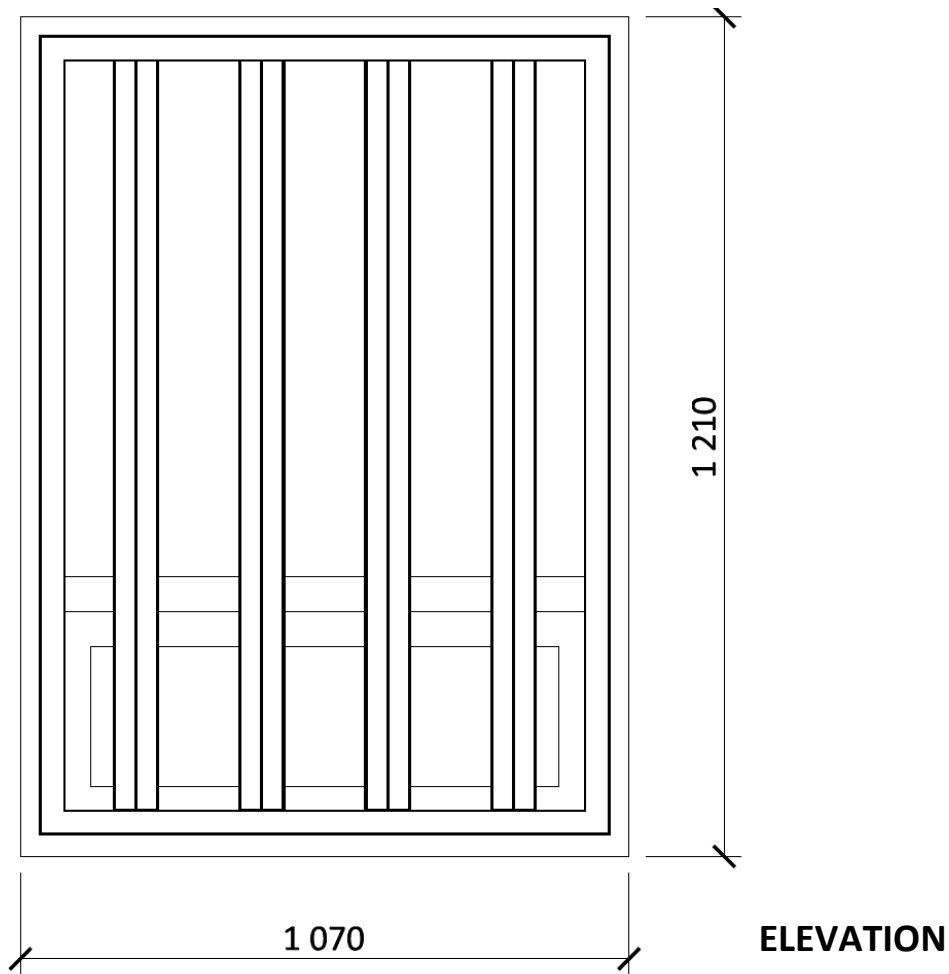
TYPICAL DW-1 WINDOW
